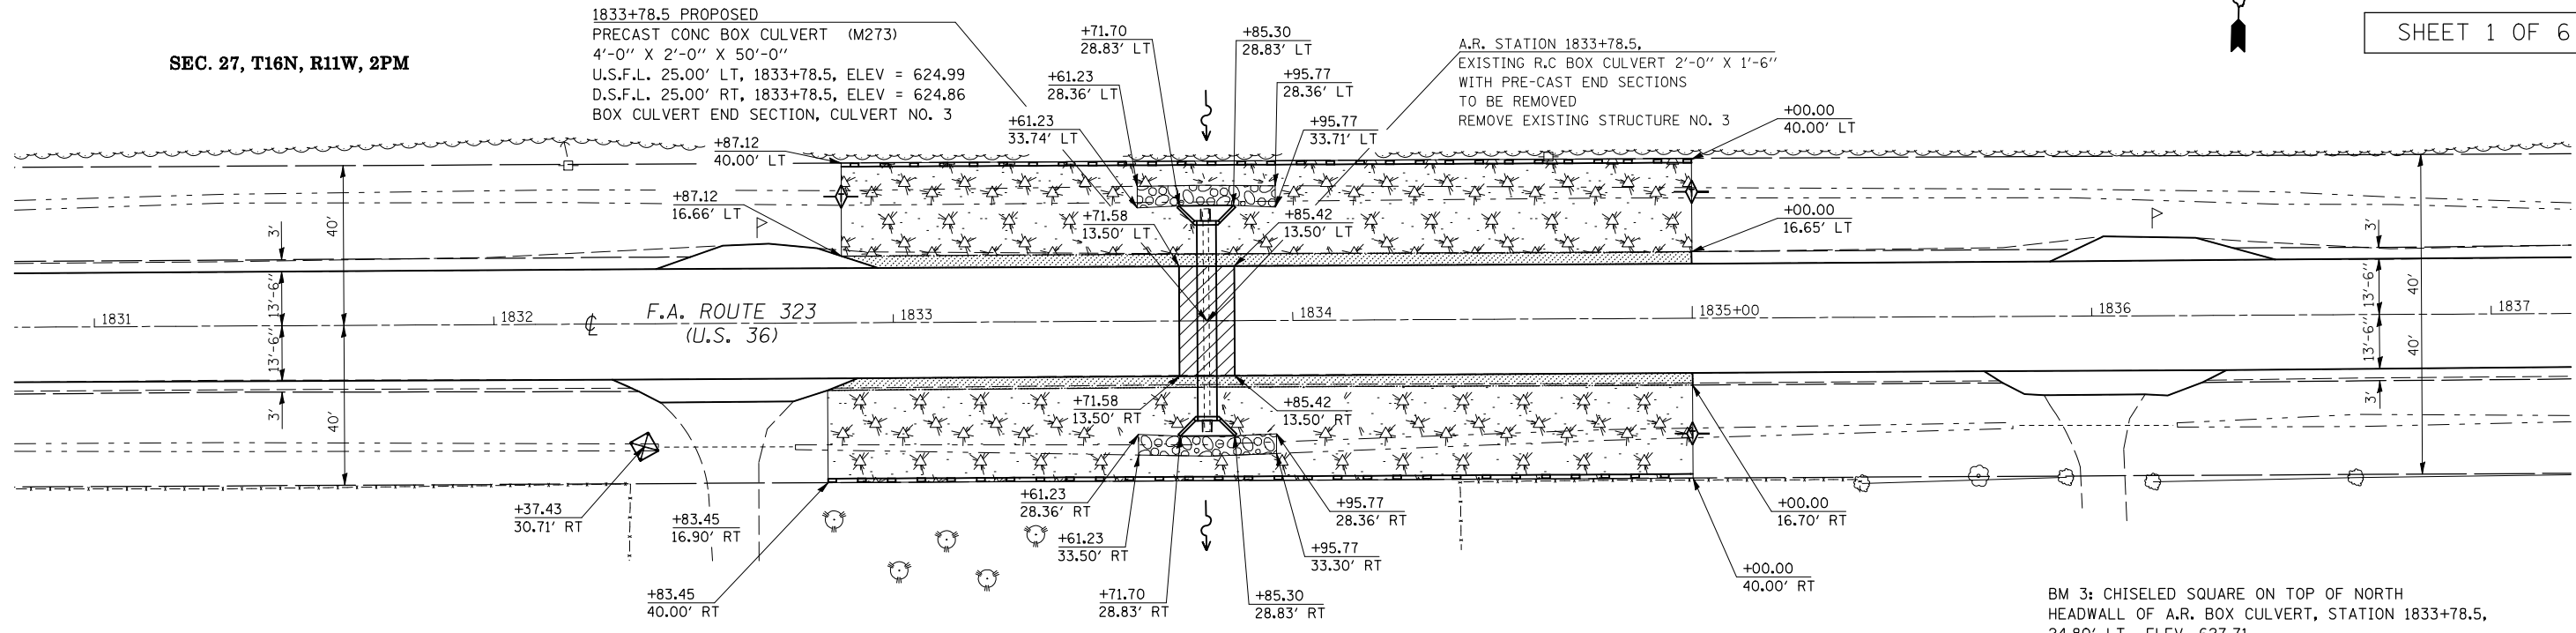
DETAIL OF ACROSS ROAD BOX CULVERT NO. 3
